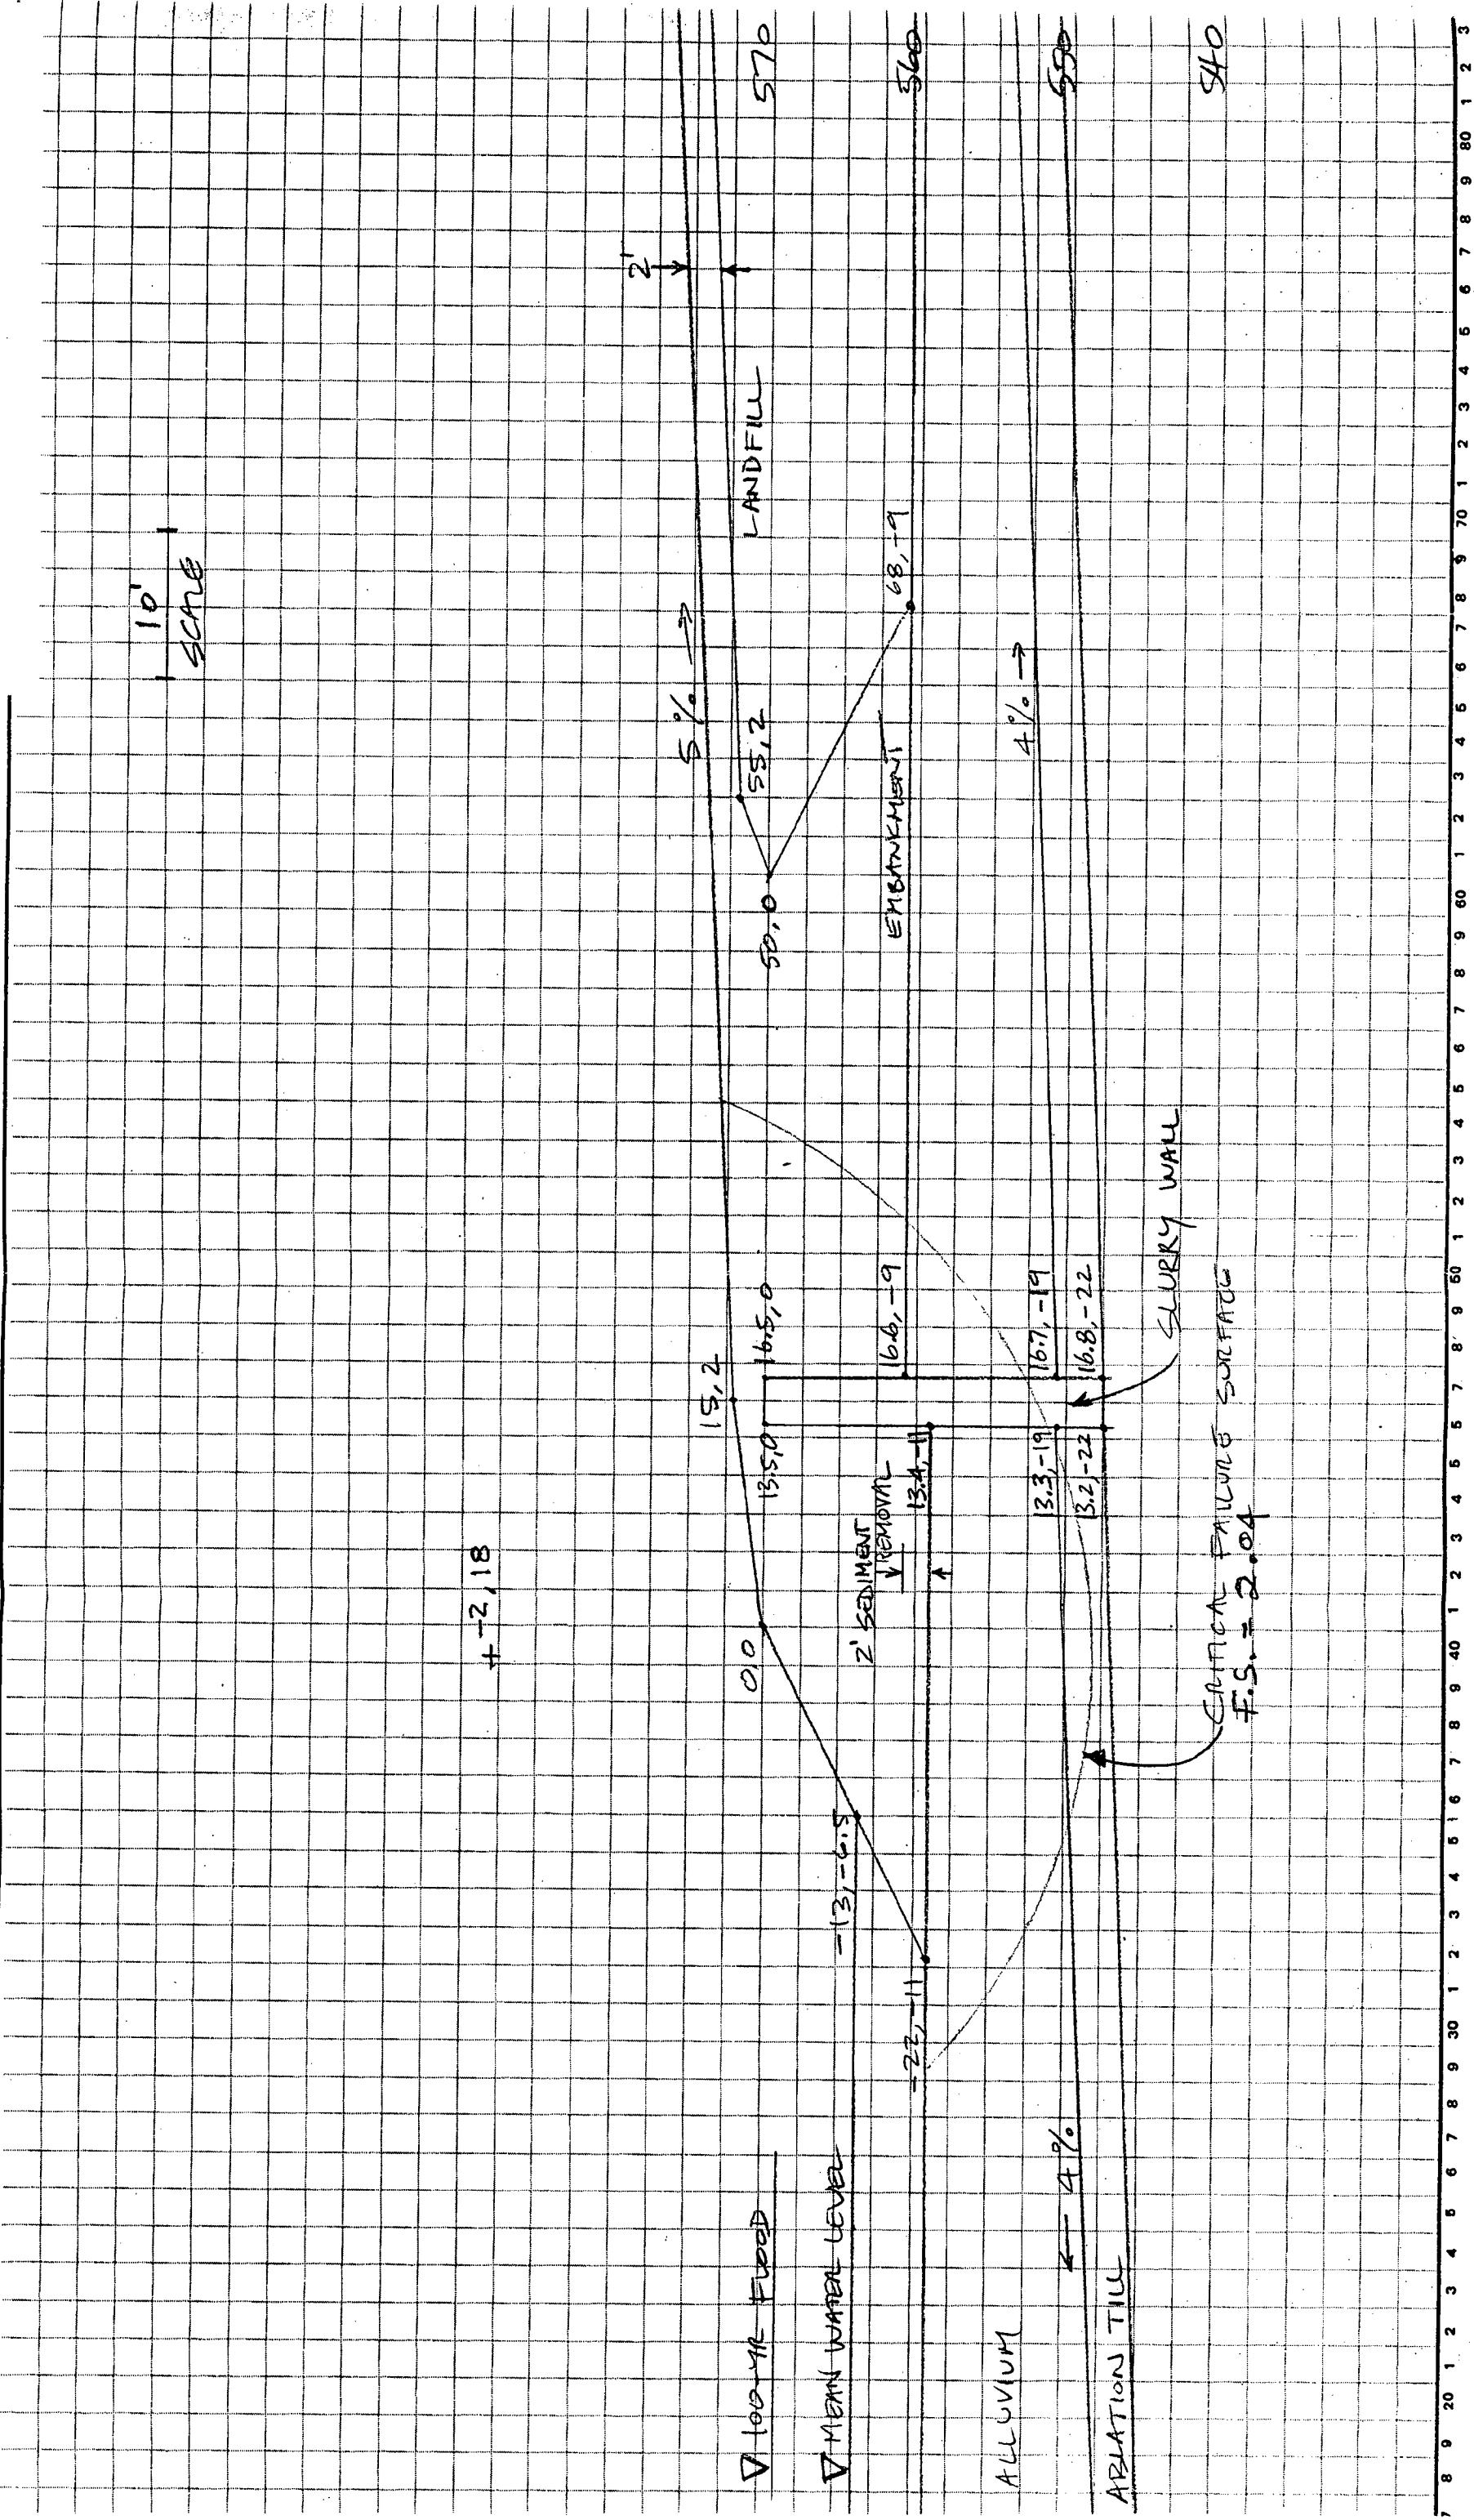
BULKHEAD, OUN PROPERTY, CROSS-SECTION NO. 1
